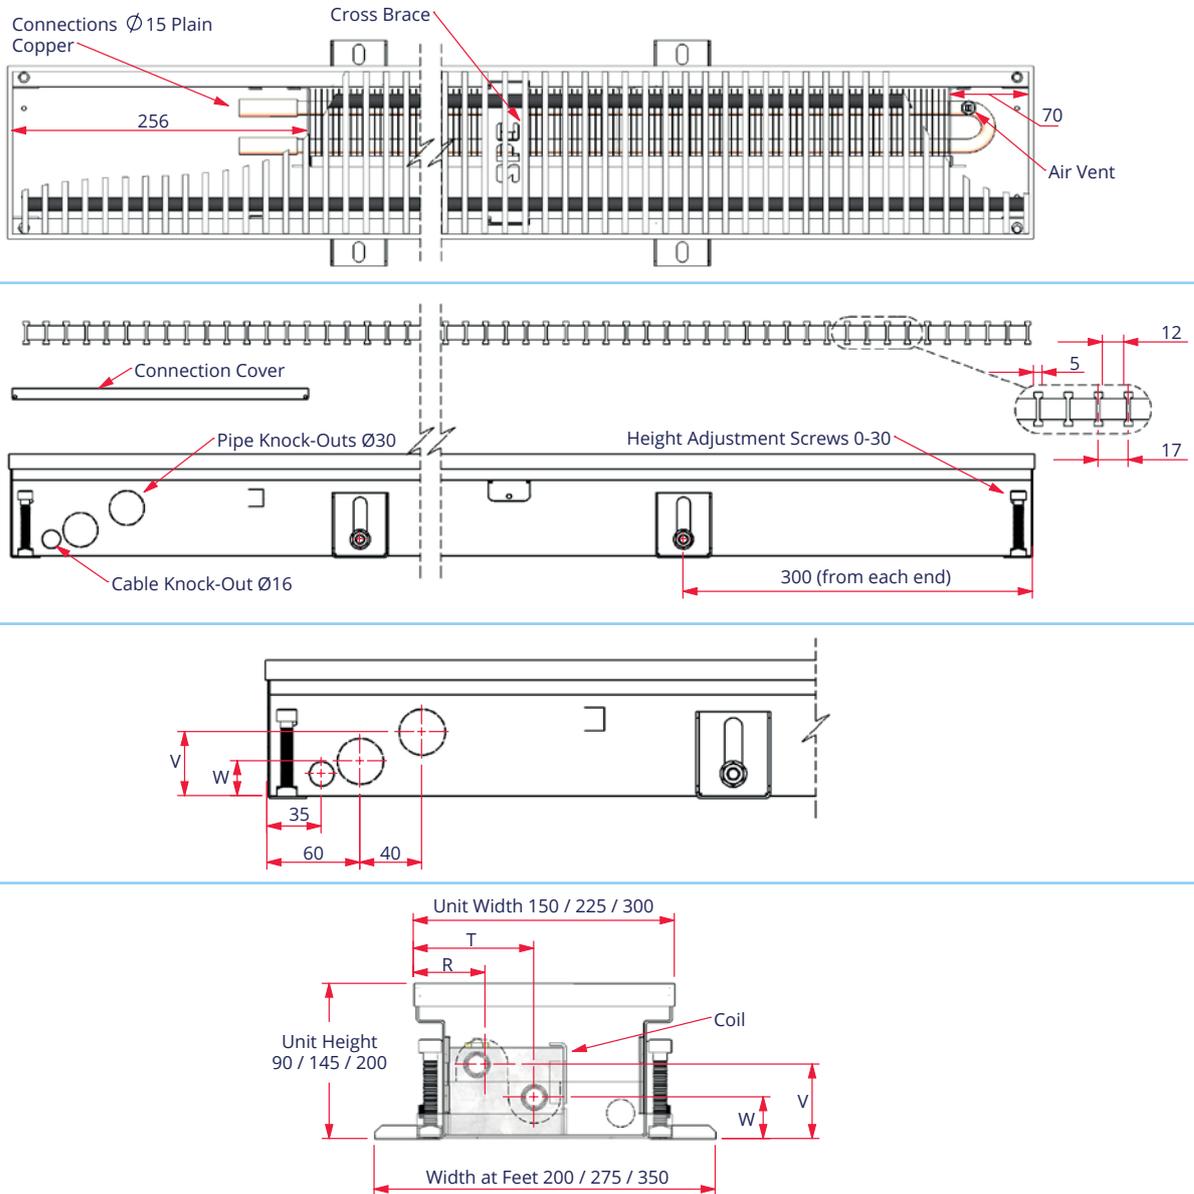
shows the various cross-sectional dimensions of the standard trench units. When installing in a concrete floor the minimum clearances should be observed. The fixing feet require 20mm on either side and it is suggested that this is also provided at both ends. If pipework is to be run alongside the trench then it is recommended that at least 50mm clearance is provided, and ideally 100mm.
